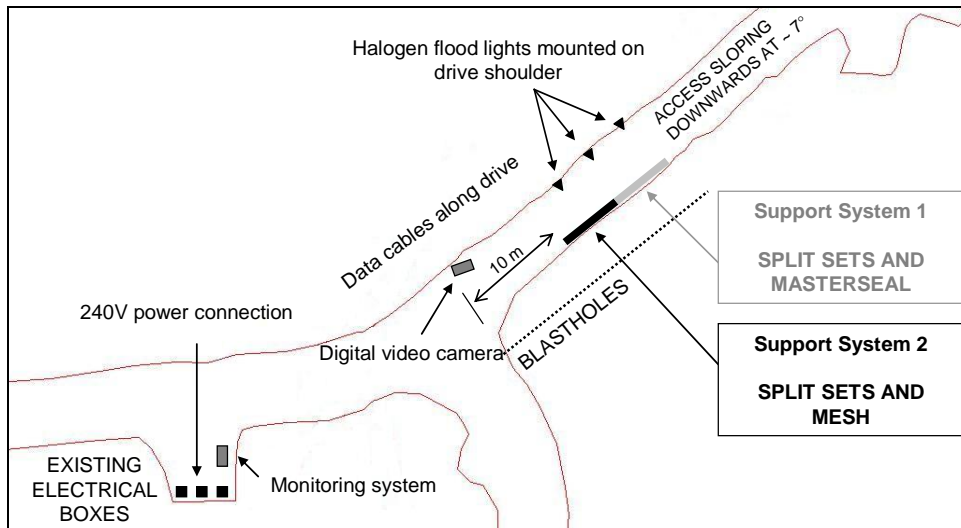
Test site layout from the Mt Charlotte test site (April 2005)
